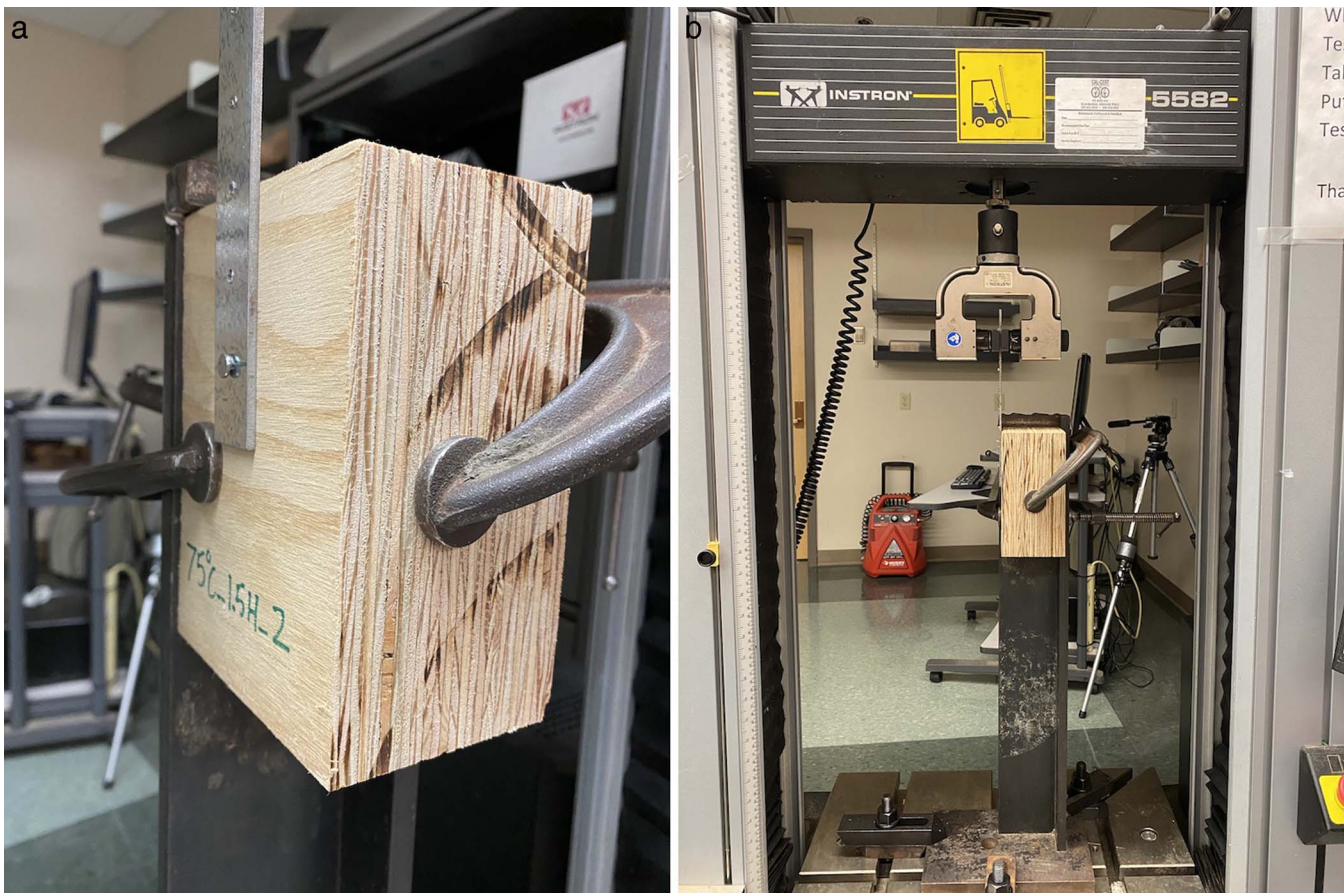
(a) Details of a specimen and (b) connection test setup.
